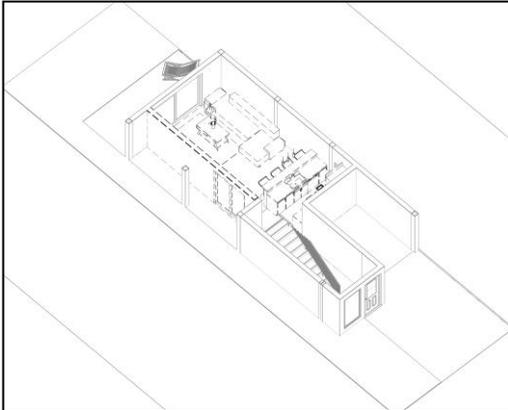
Ground floor 3D plan in stage two – dashed lines show demolished elements
